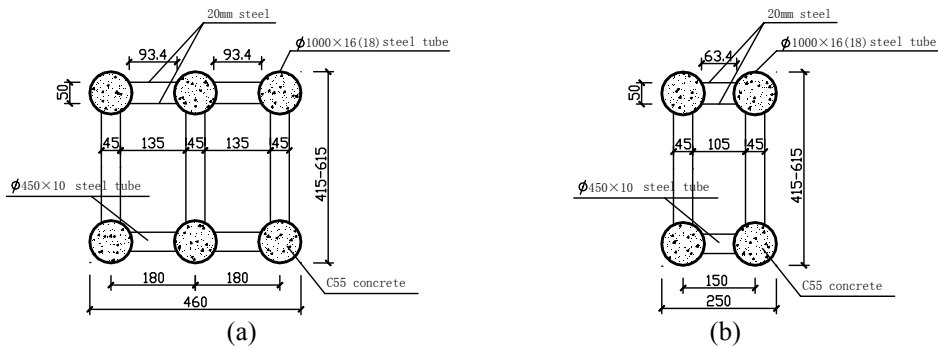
The arch rib cross section (unit: cm): (a) Center arch rib, (b) Side arch rib
